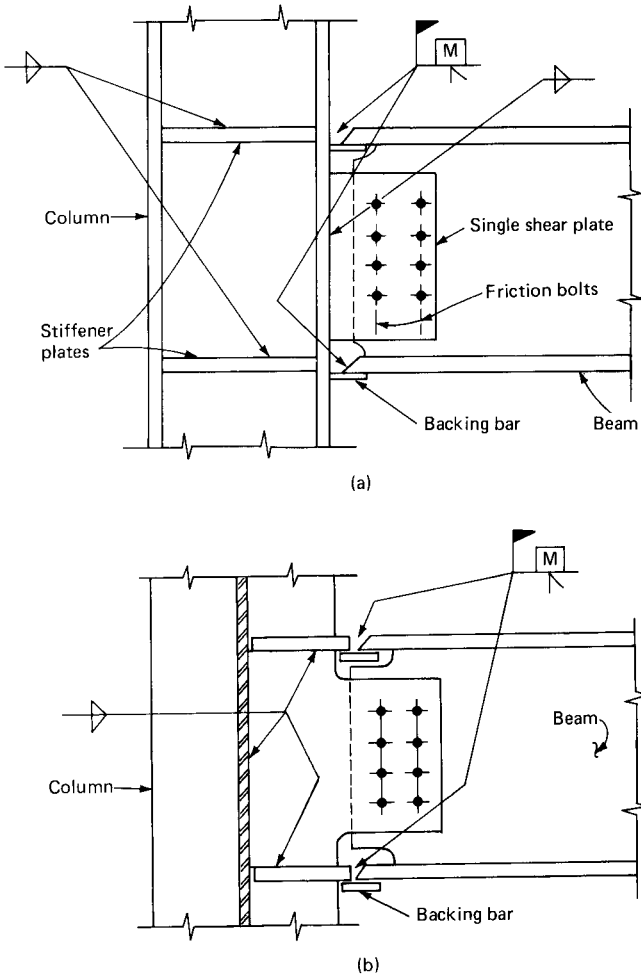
Beam-to-column welded moment connections. (a) Beam-to-column flange connection; (b) beam-to-column web connection.
